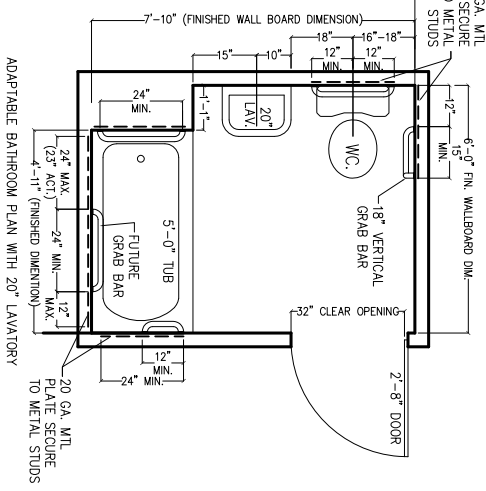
Adaptable Bathroom Plan with 20" Lavatory
